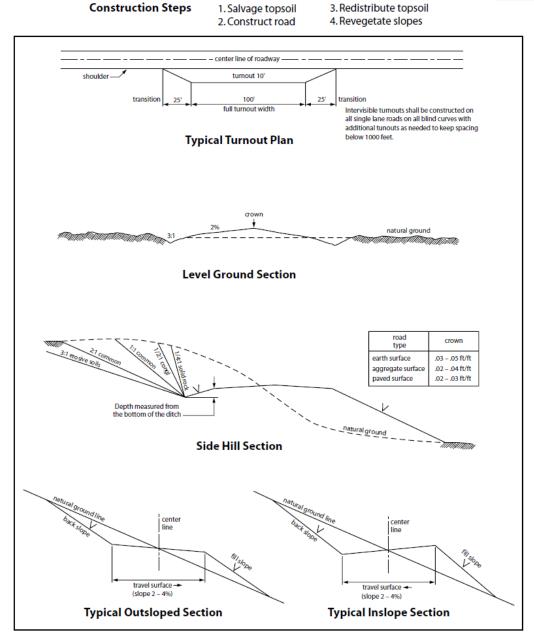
Cross-sections and plans for typical road sections representative of BLM resource or FS local and higher-class roads.
